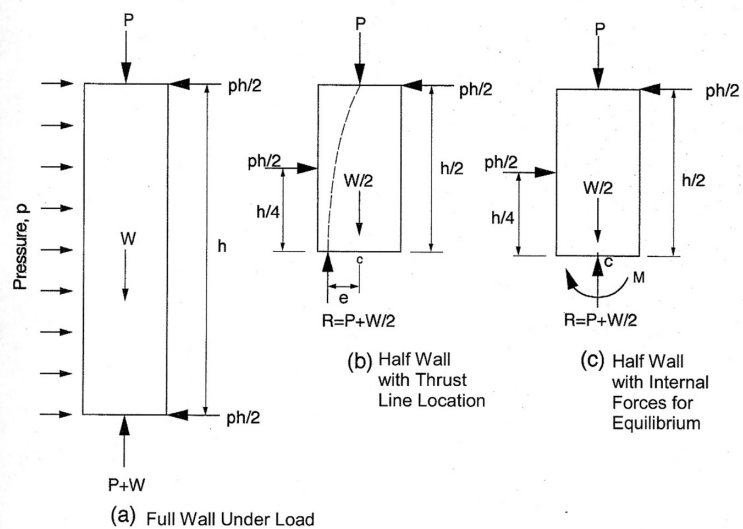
Masonry walls under axial load and lateral wind pressure.
